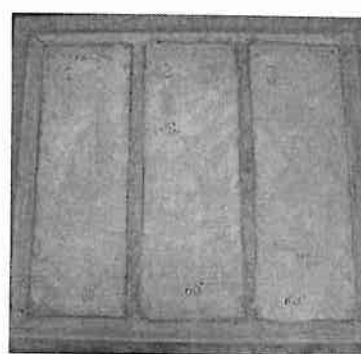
Specimen of mortar reinforced with EMS mounted on the testing machine.
